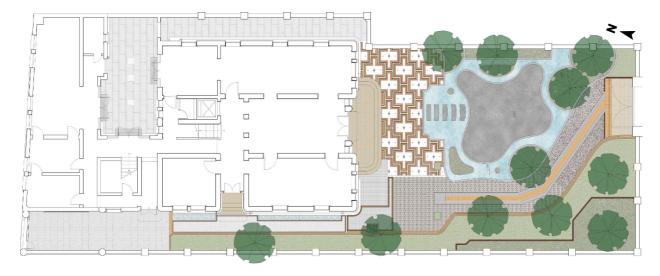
Ground floor and the courtyard plan after the acupuncture renewal design.
